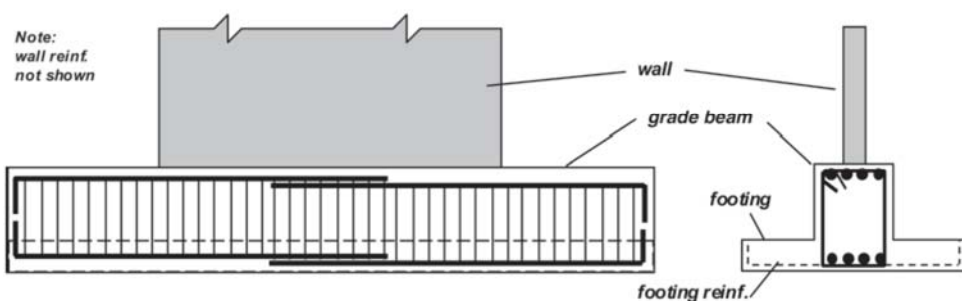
Wall footing grade beam reinforcement layout.
